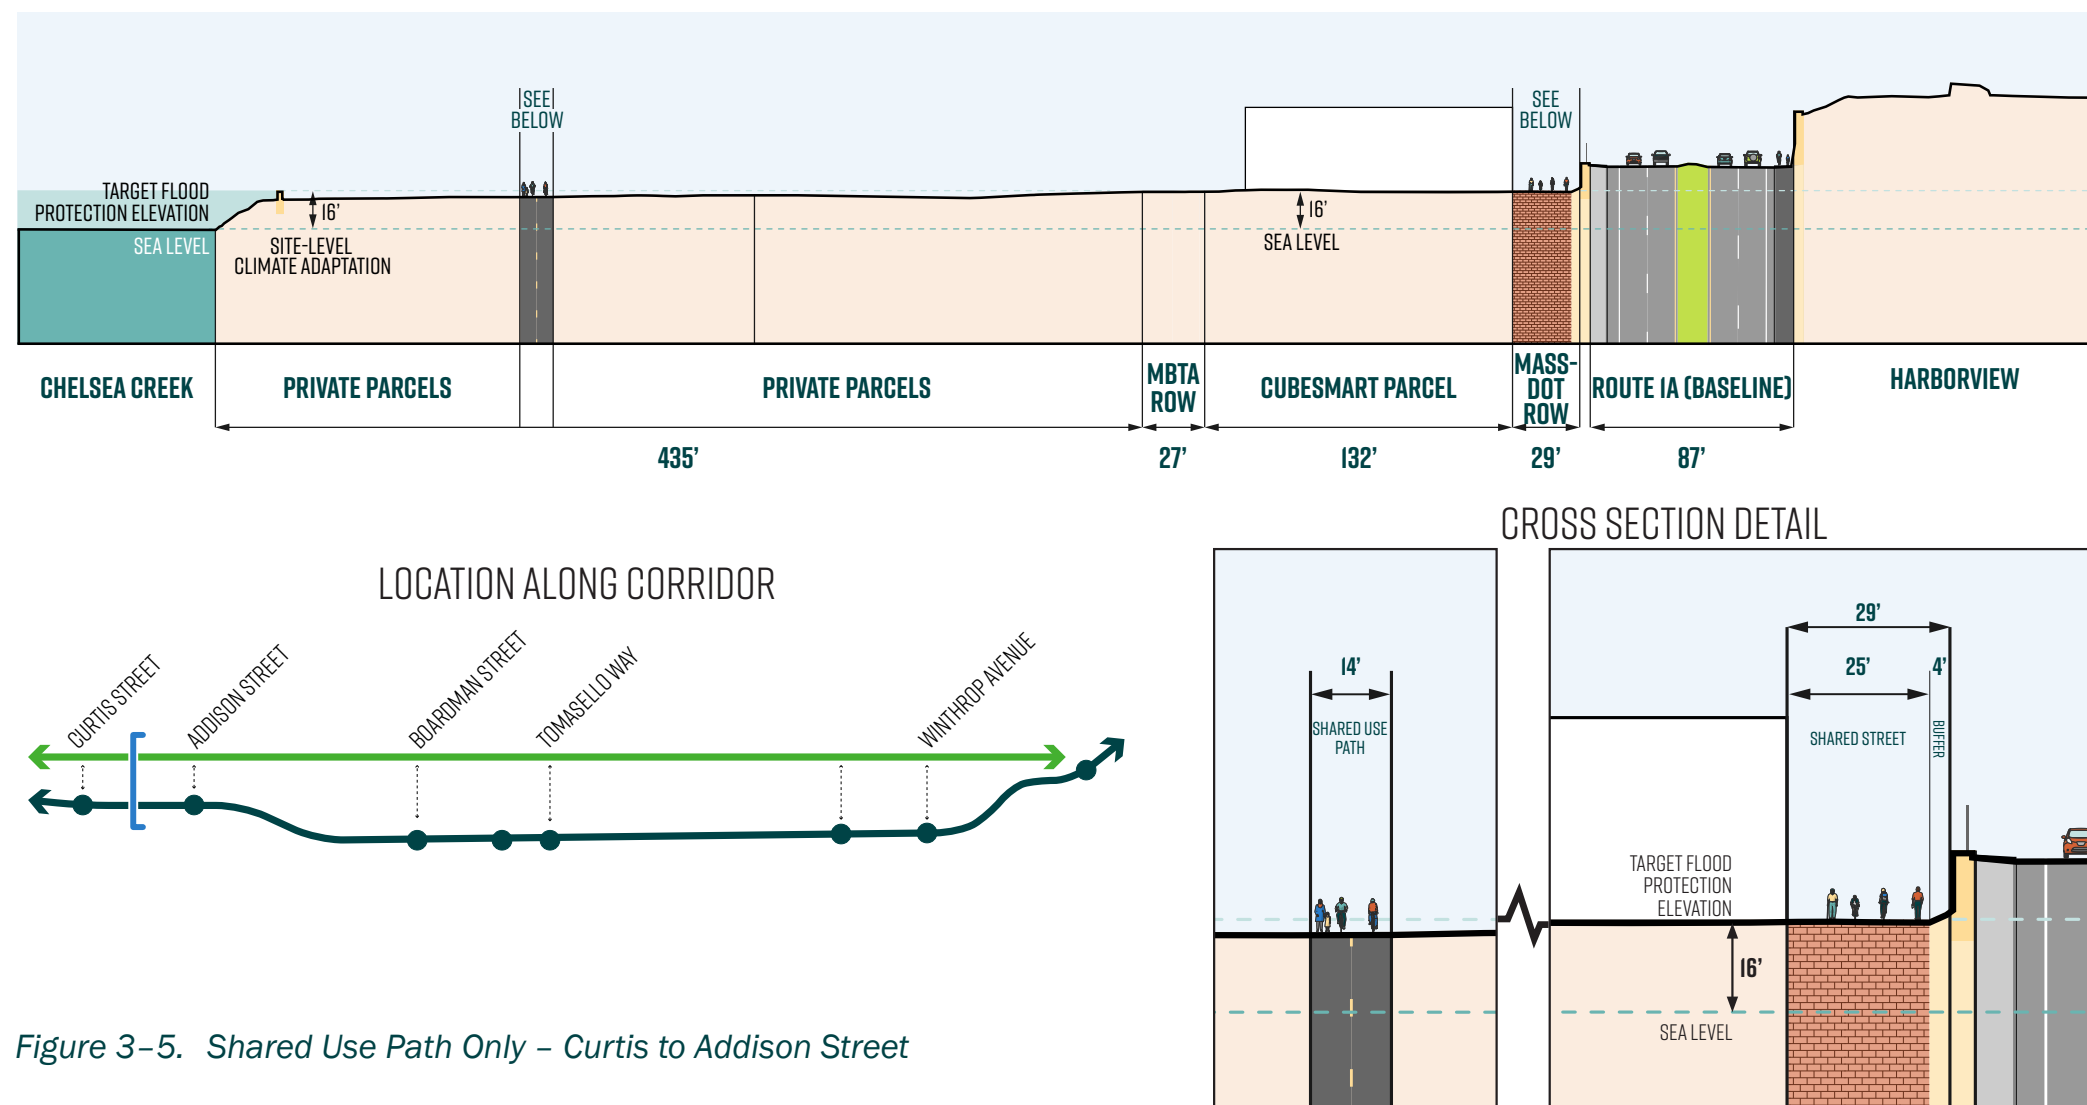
Shared Use Path Only – Curtis to Addison Street
